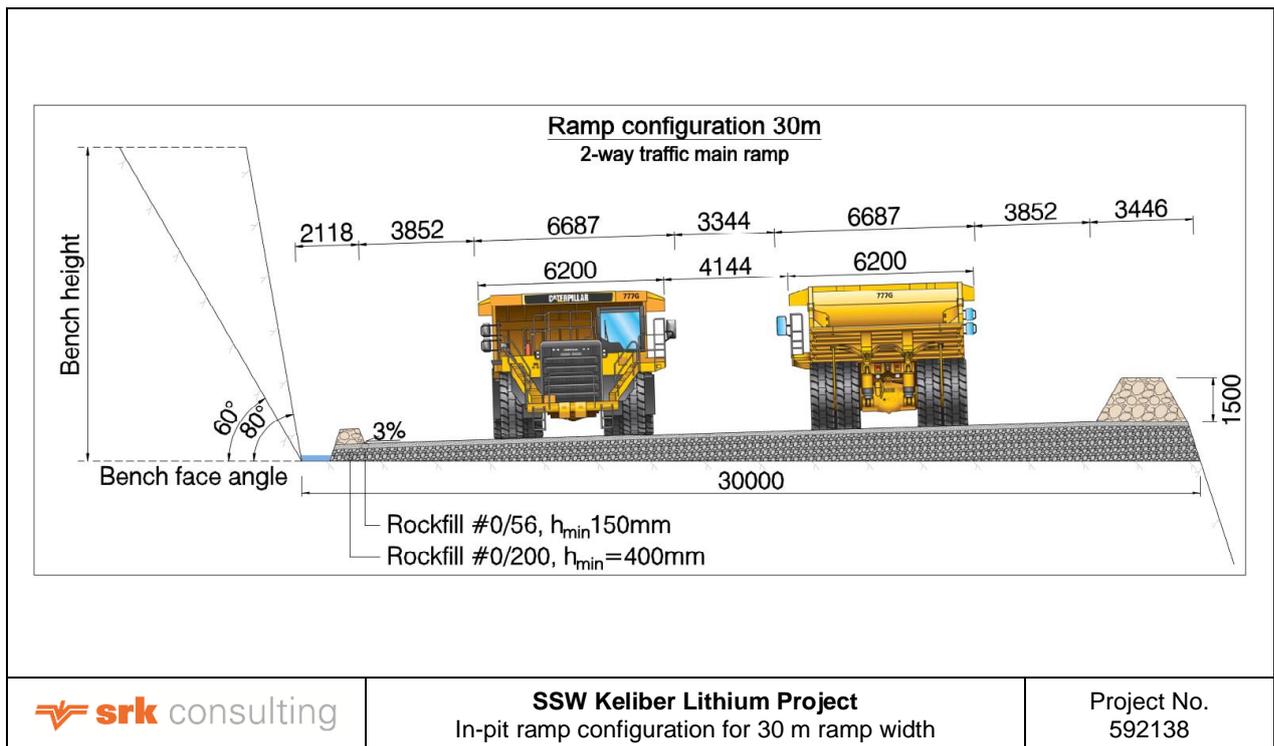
In-pit ramp configuration for 30 m ramp width
